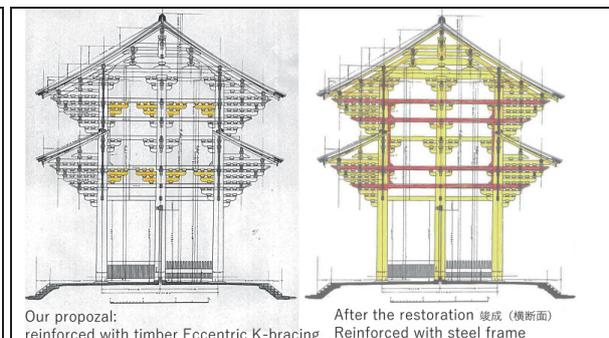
Our proposal (reinforced with timber Eccentric K-bracing) and restoration reinforced with steel frames in 1930.
